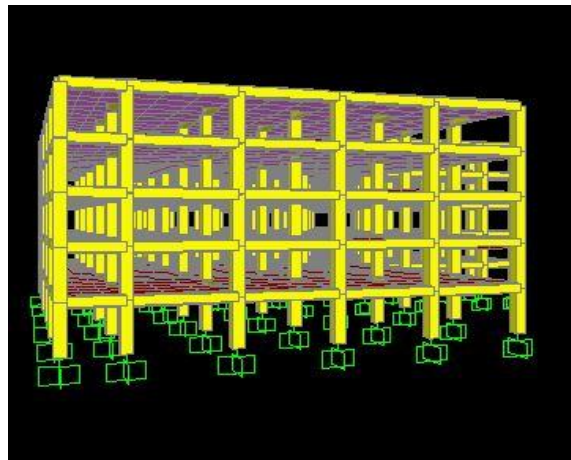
Design of Multilevel parking #1 (SAP2000)
